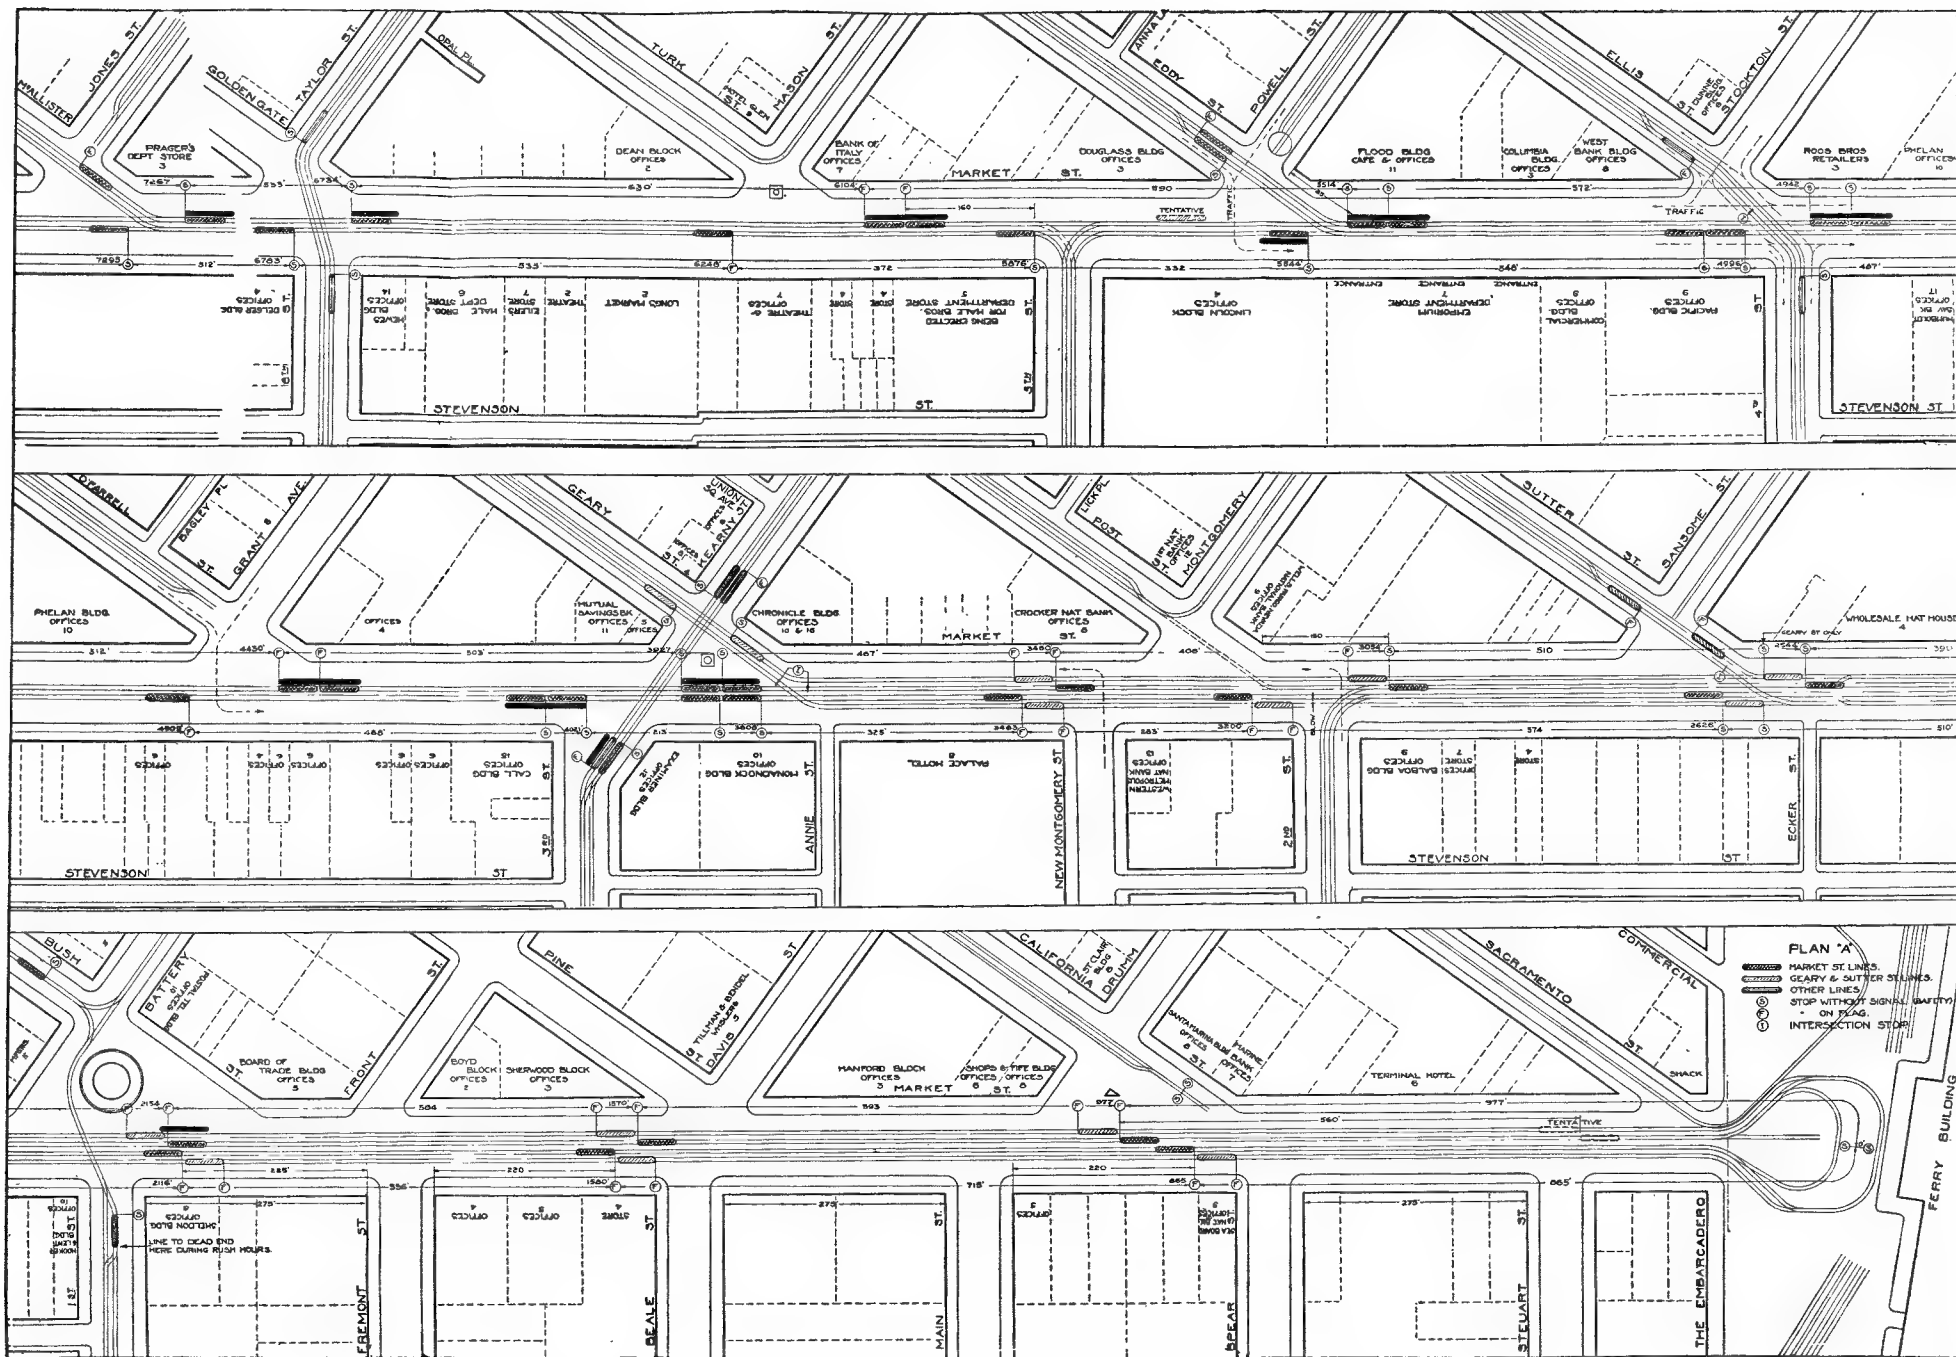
FOUR-TRACK PLAN OF STOPS AND STATIONS FOR LOWER MARKET STREET AS RECOMMENDED, PLAN A.
